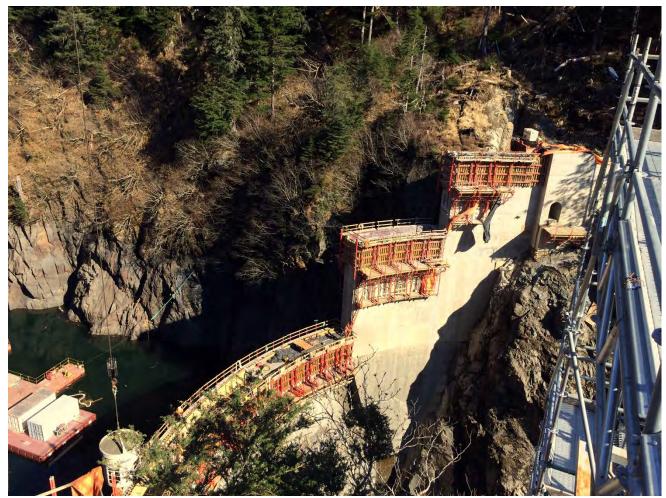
Dam and Left Abutment Area, Barnard made final concrete placement on dam keyway and began forming for dam raise blocks M3-M5 (in the old spillway).
